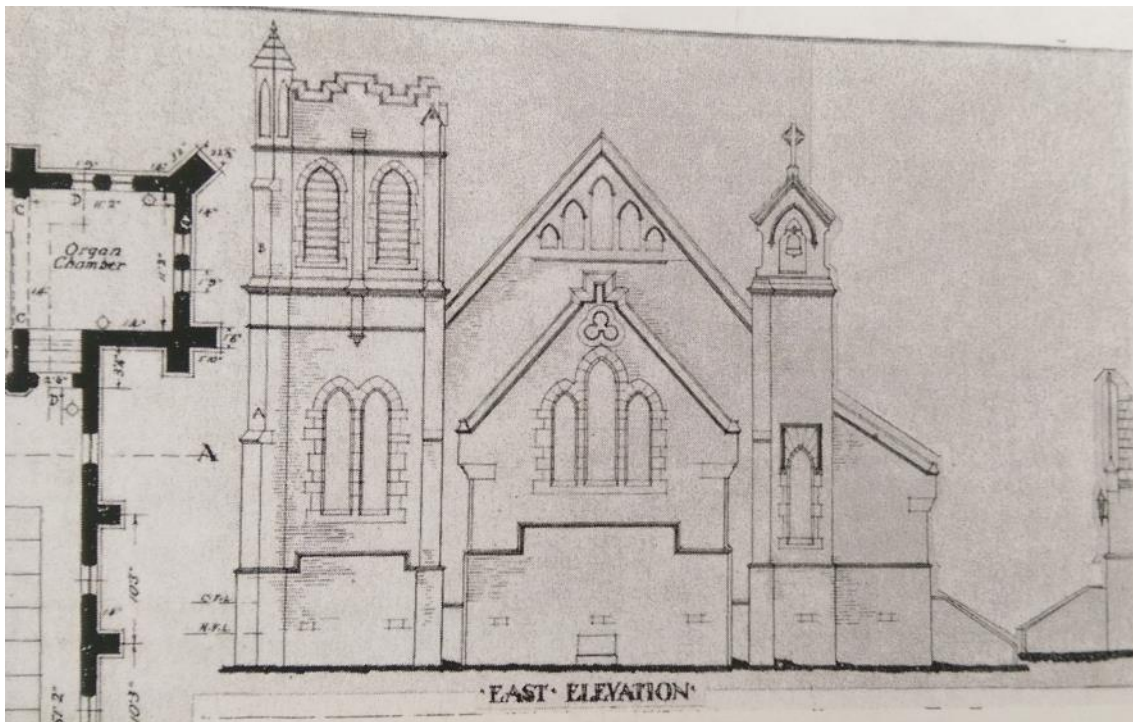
The east elevation of St Andrew's Church. It is assumed that the drawing is a copy of the original plans drawn by architect, John Routly, but this has not been verified. Note proposed taller tower (photograph of a copy, courtesy St Andrew's Church personal records).
